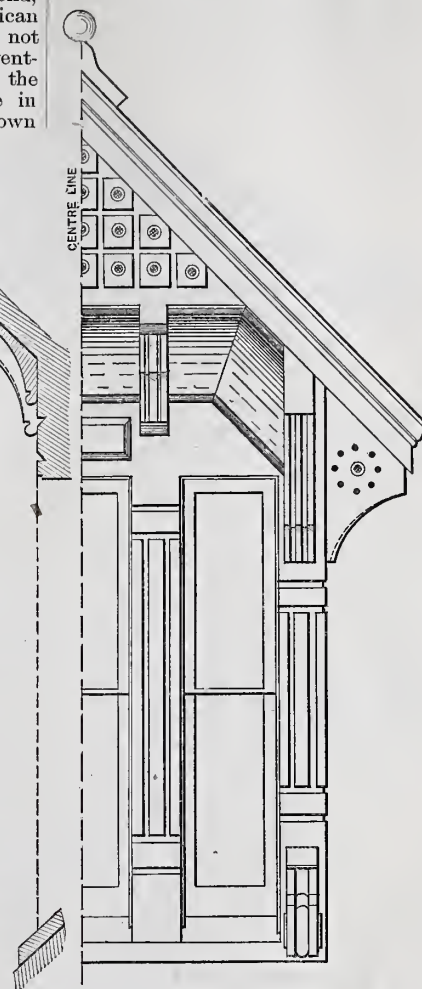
Half Front Elevation of Dormer Window.—Scale, $\frac{1}{2}$ Inch to the Foot.
